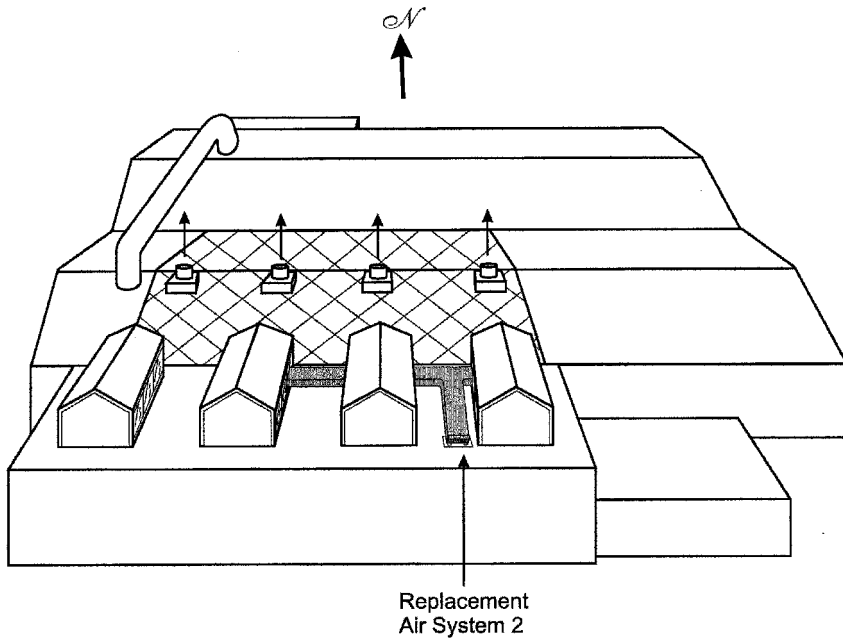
Replacement-air system 2 (RAS-2) for the four roof exhausters (63,500 cfm, $30.1 \text{ m}^3/\text{s}$) located over the floor pouring area shown in the shaded roof area (viewed from south end of building).
